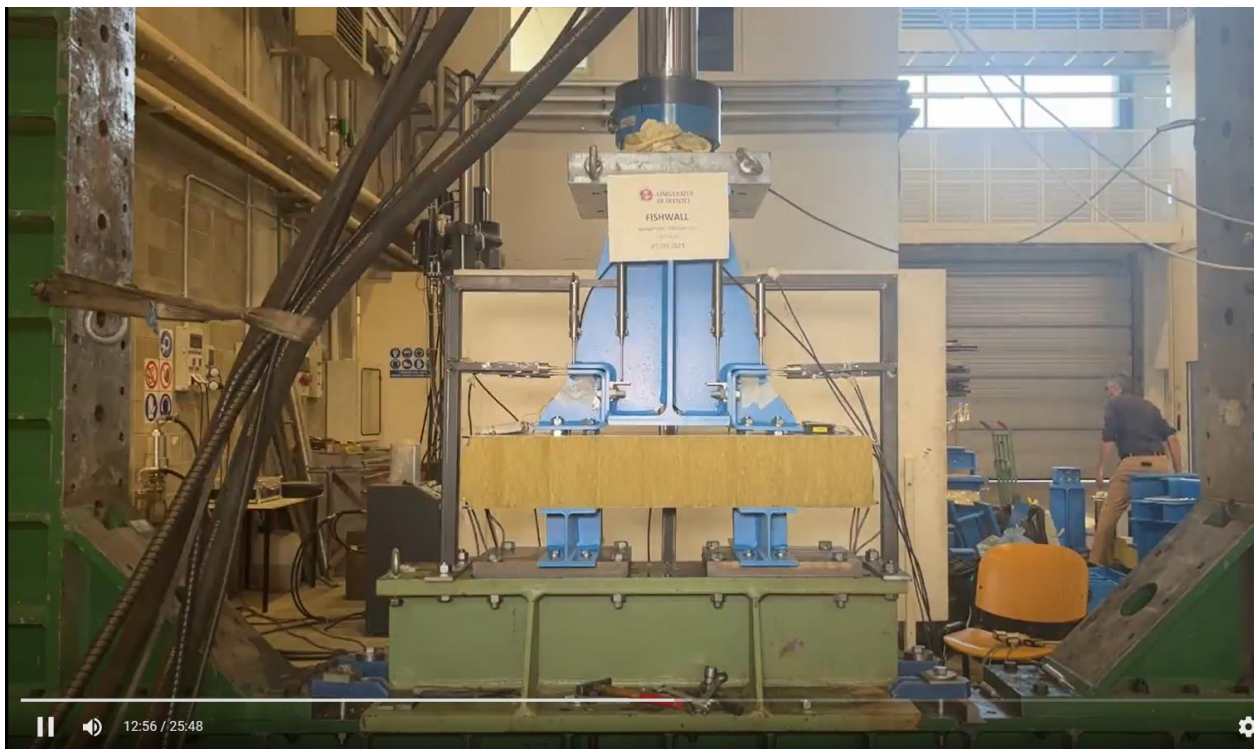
Detail 2 – tension test – deformation at 12 minutes.
